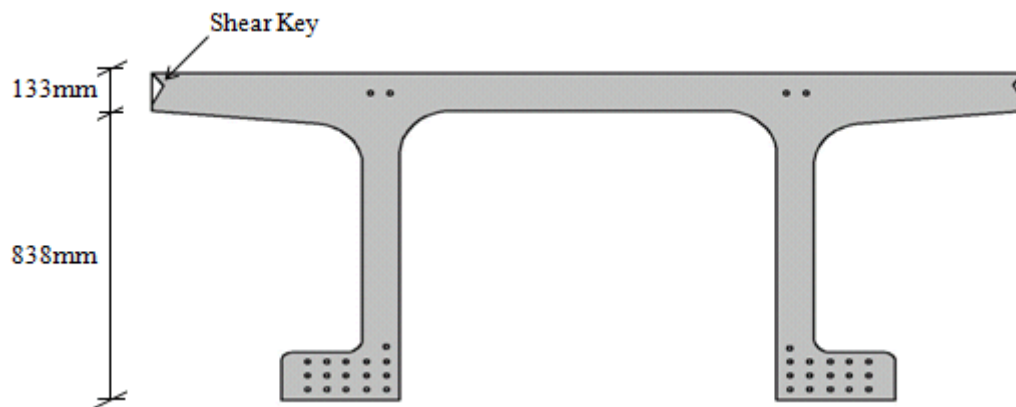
UHPFRC π -girder cross section. Adapted from Graybeal (2009)
